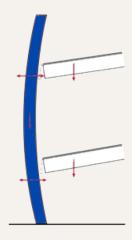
Floors not connected to URM walls are at risk of disconnecting and falling.
